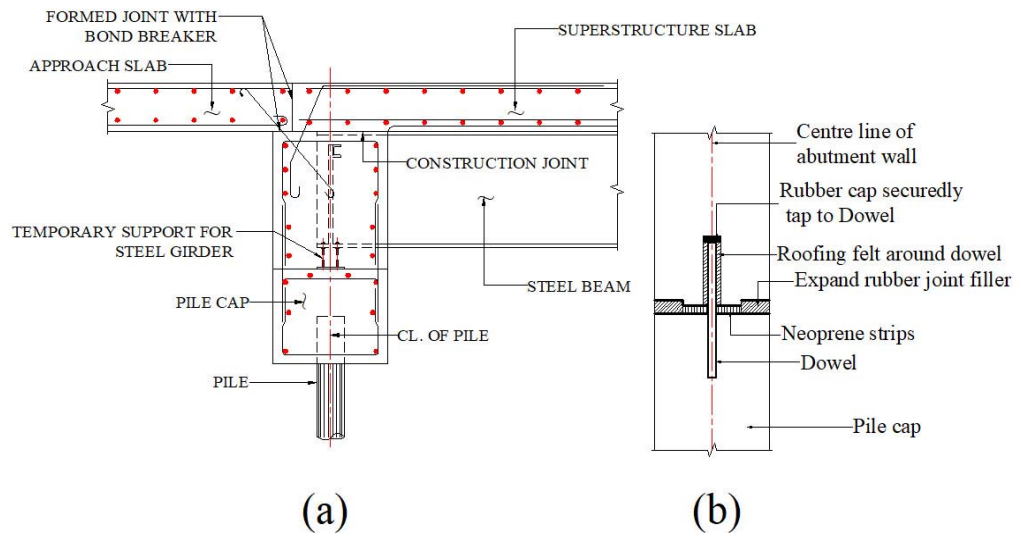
Full IAB (a) with Steel girder superstructure (b) Hinge detailing of VDOT
